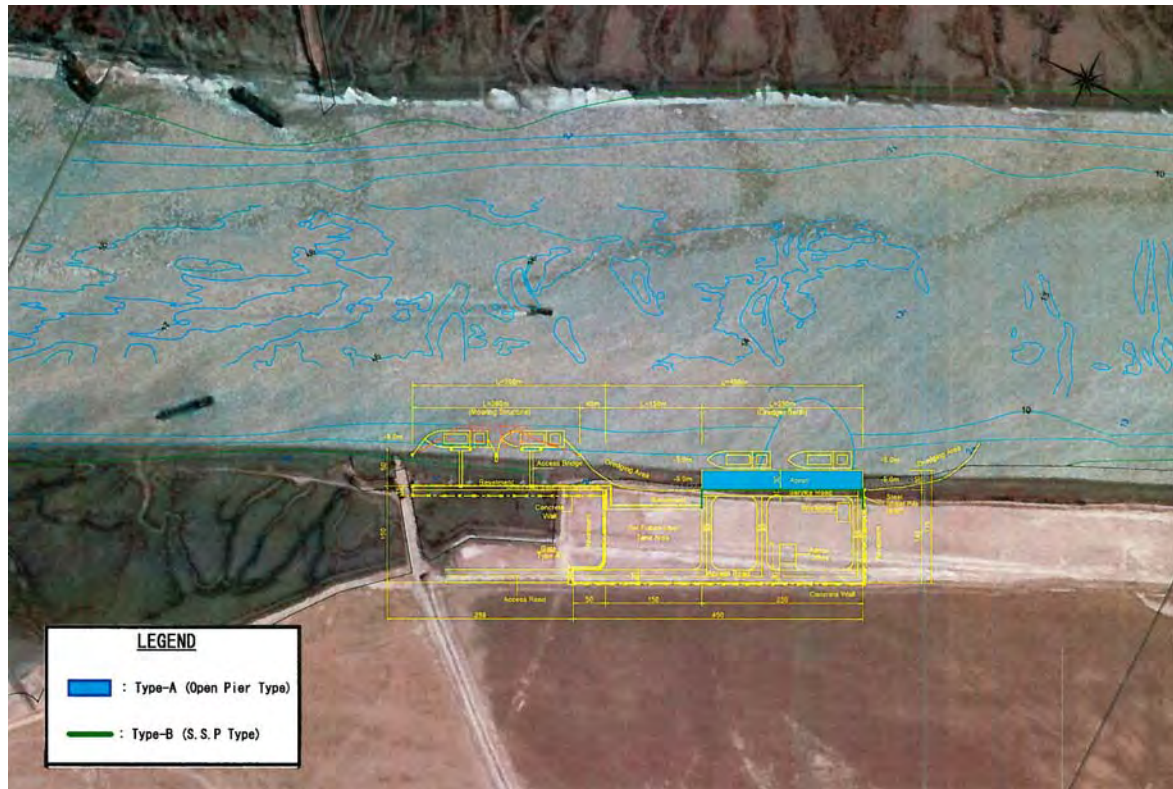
Layout Plan of Service Berth for Dredgers (Alternative A)
